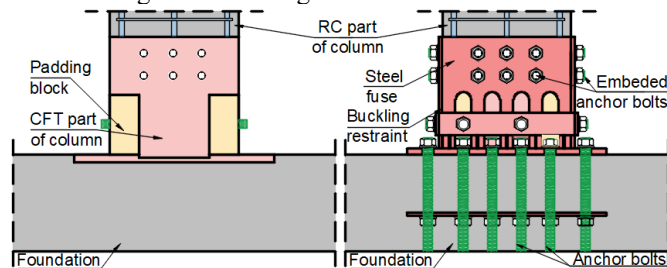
The configuration of the column-to-foundation connection adapted from Guo et al. [23]
